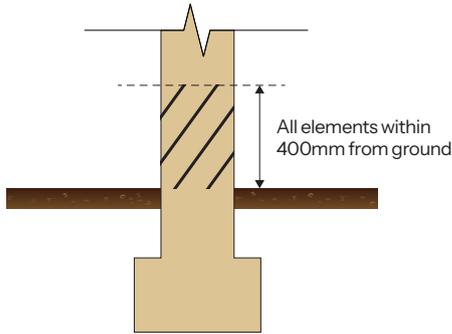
Construction requirements for external walls, glazing or door joinery within 400mm of ground level
